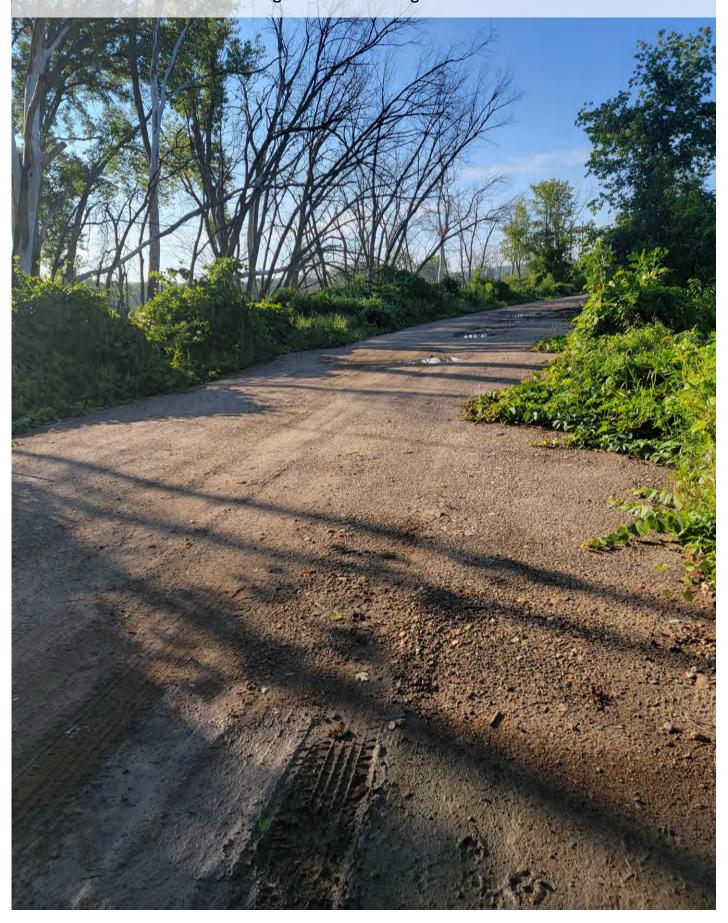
B. Frog and typical Vernon Avenue road surface near Photo 2 location Sand and fine to coarse aggregate
